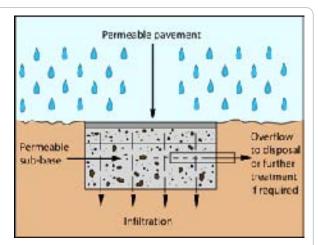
Permeable pavements reduce run-off and the need for surface water drains.
